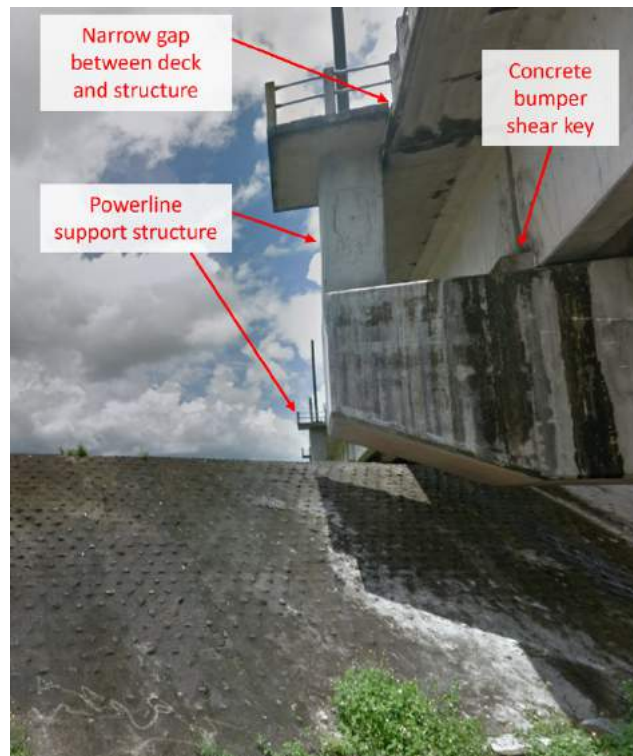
Google Street view from 2012 showing the intact powerline support structure and concrete bumper shear key (23.27468°, 121.30489°)
